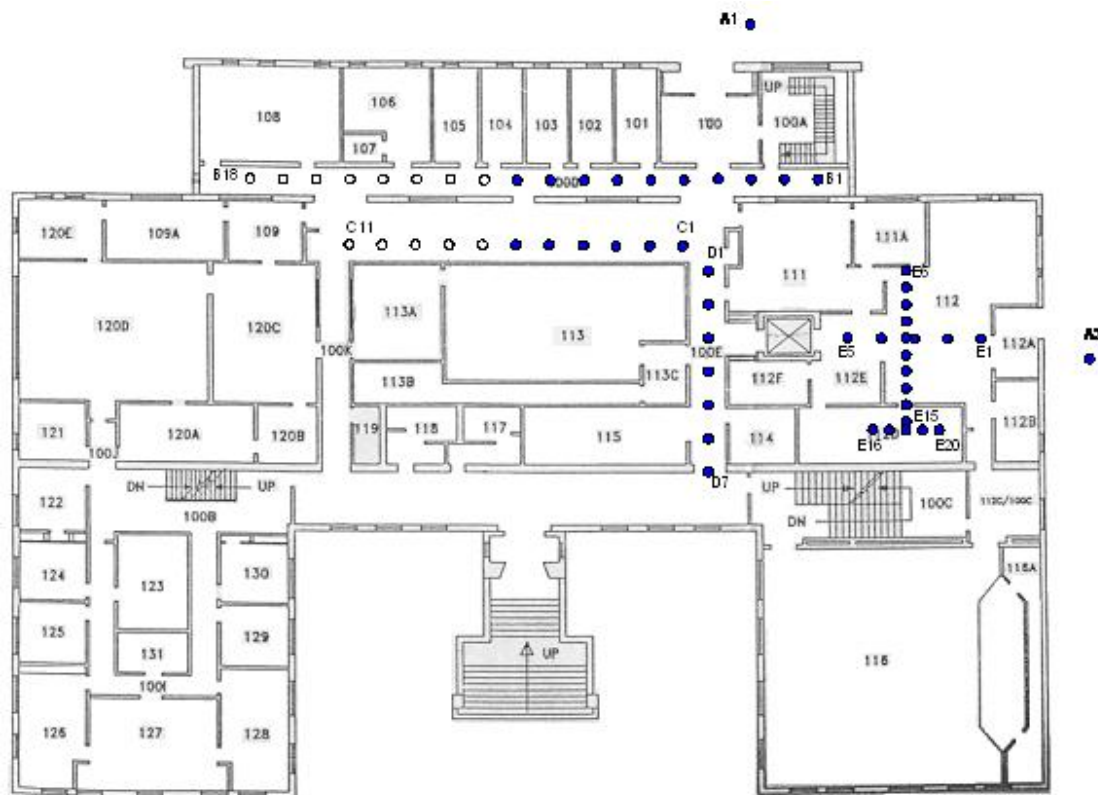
Measurement plan at 1st Floor with Tx located at A1 and A2, AK Laboratories
